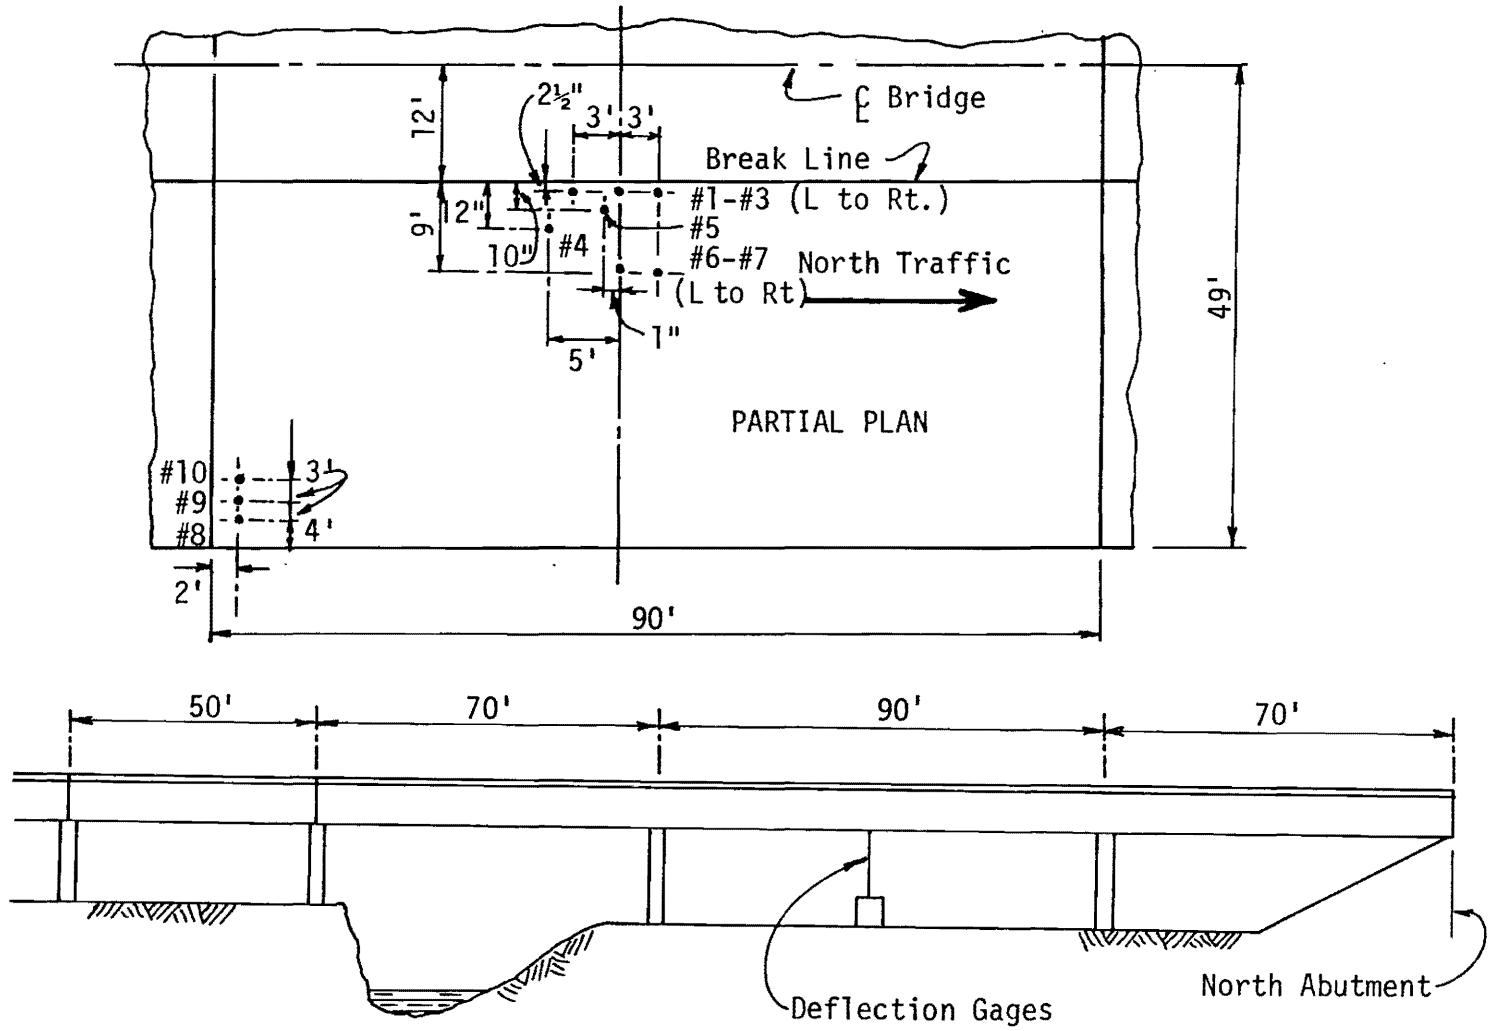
US 75 & White Rock Creek, Northbound: Core Locations.
